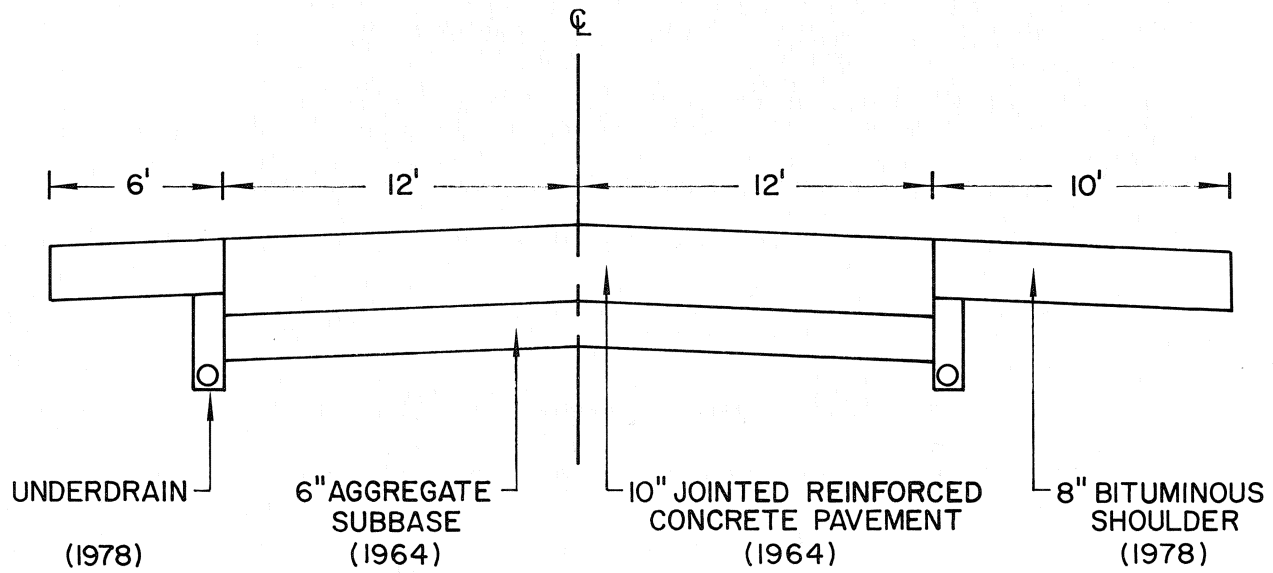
CROSS-SECTION OF ORIGINAL PAVEMENT
